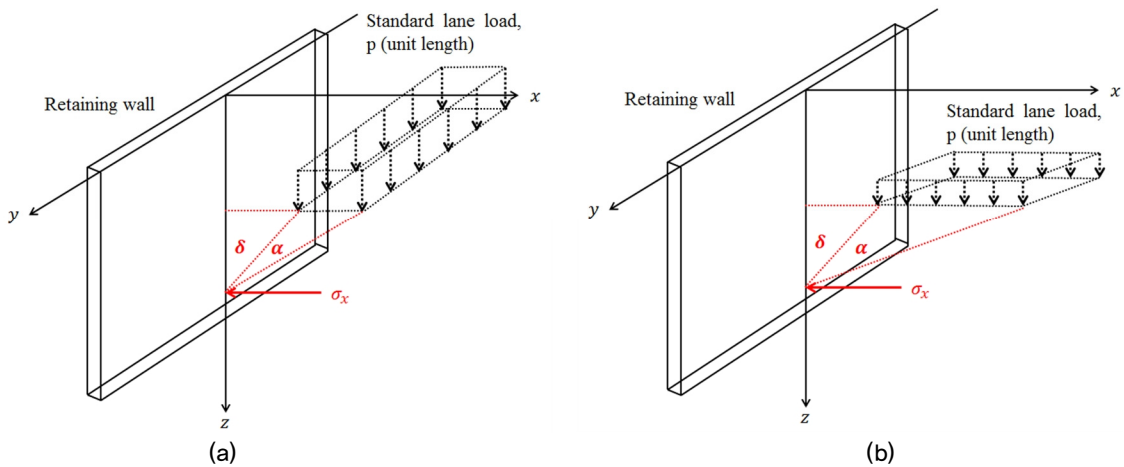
The horizontal stress on retaining wall induced by standard lane load when traffic direction is (a) parallel to the retaining wall length direction and (b) perpendicular to the retaining wall length direction
